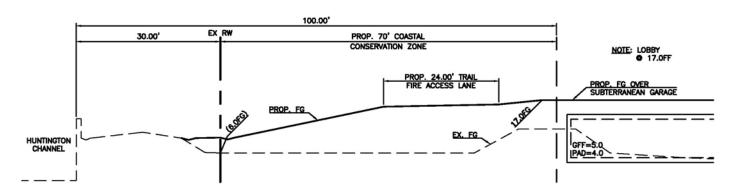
Typical Fire Access Cross Section at Lodge Section G
